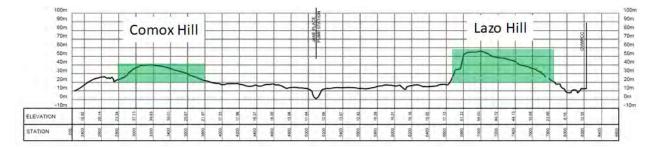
Topographic profile of the trenchless sections. Green shading represents feasible elevations of the trenchless alignments based on current understanding of groundwater conditions.
